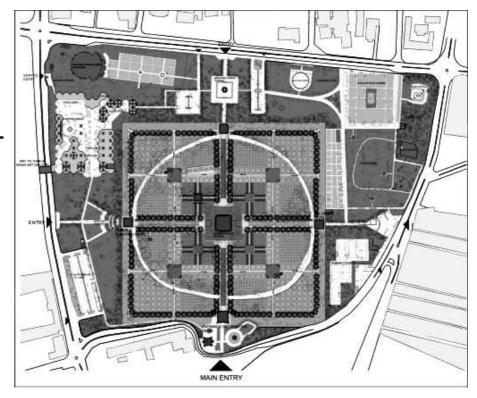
Proposed Conservation Development Plan (Source: Gurmeet Rai)
